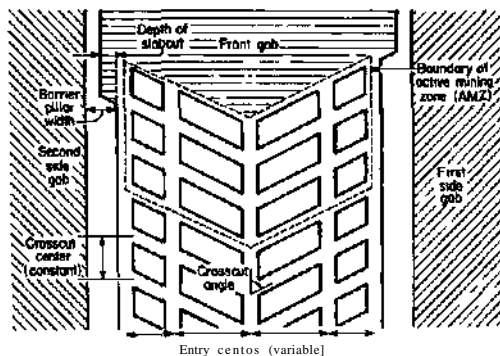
Model of a room-and-pillar mining section used by the ARMPS program.
